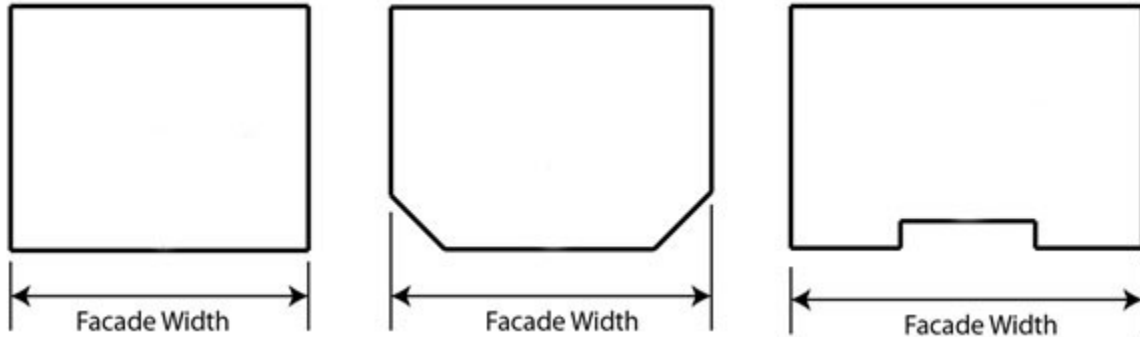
G: Illustration of façade width measurement on varied façade shapes.
